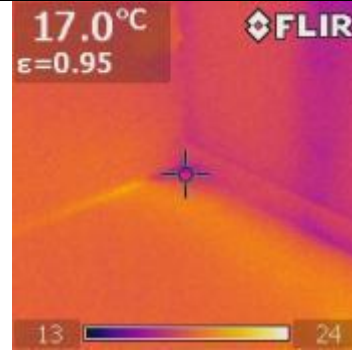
Living room, Leak in corner between skirting-board and floor.
